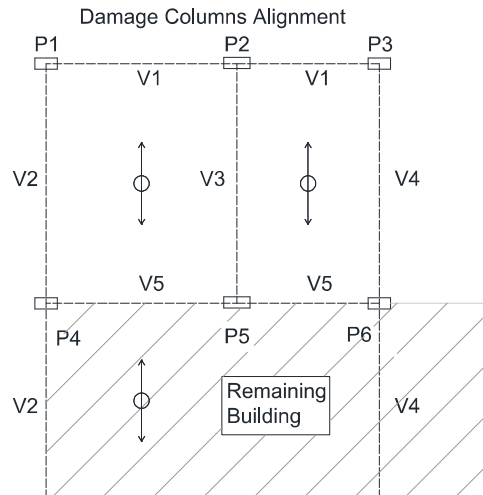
Schematic drawing of the elements' arrangement on a typical floor plan of the damaged body.
